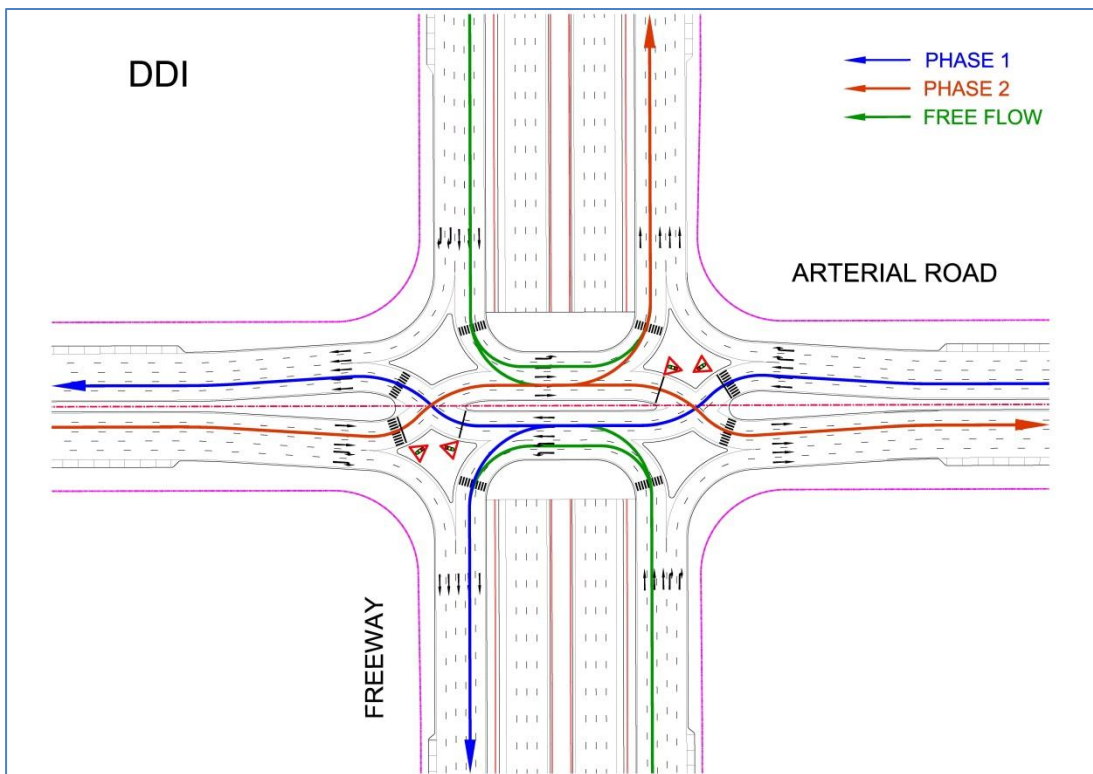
Layout Plan for a Diverging Diamond Interchange (DDI)
